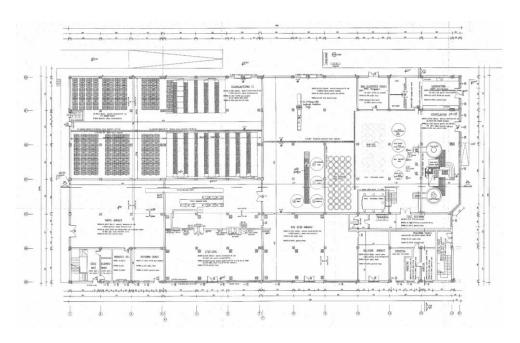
Repair project of the beer filling building, ground floor plan, 2001 (Source: TTA Archive)
